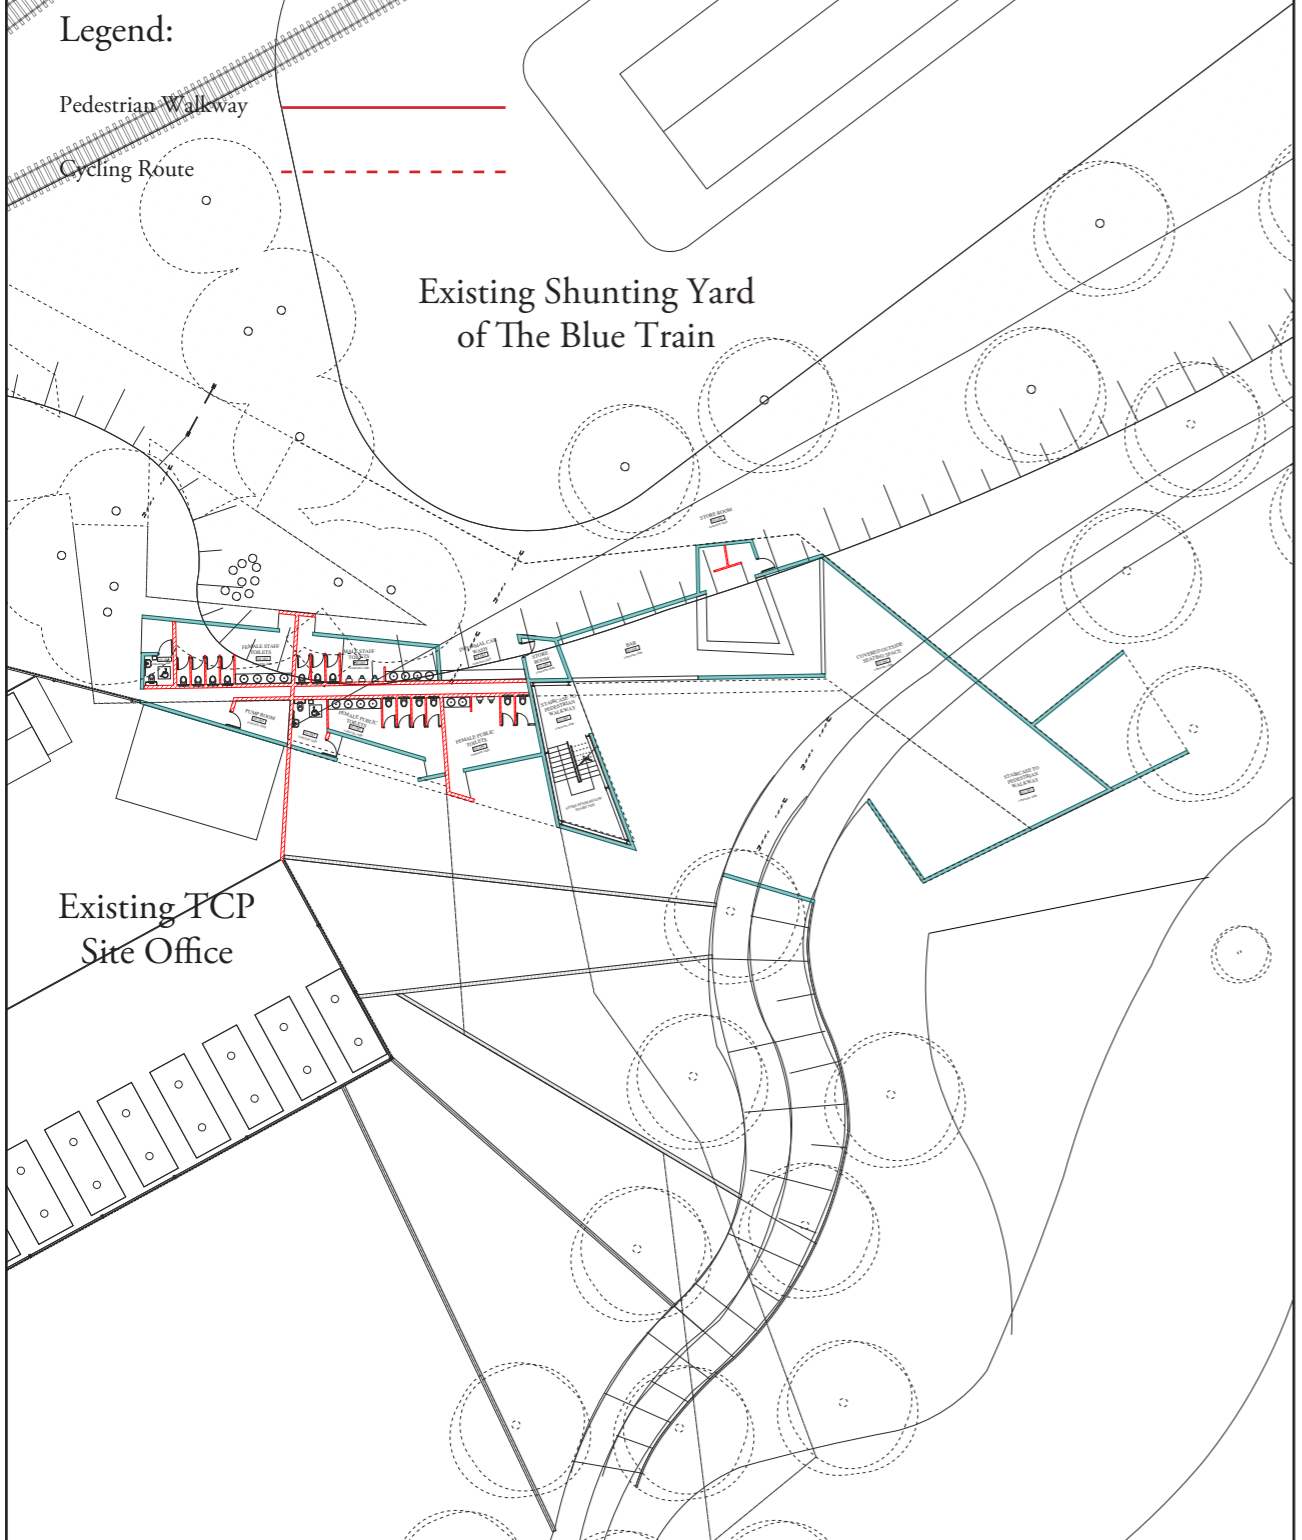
Salvokop Connection: Ground Floor Plan.
